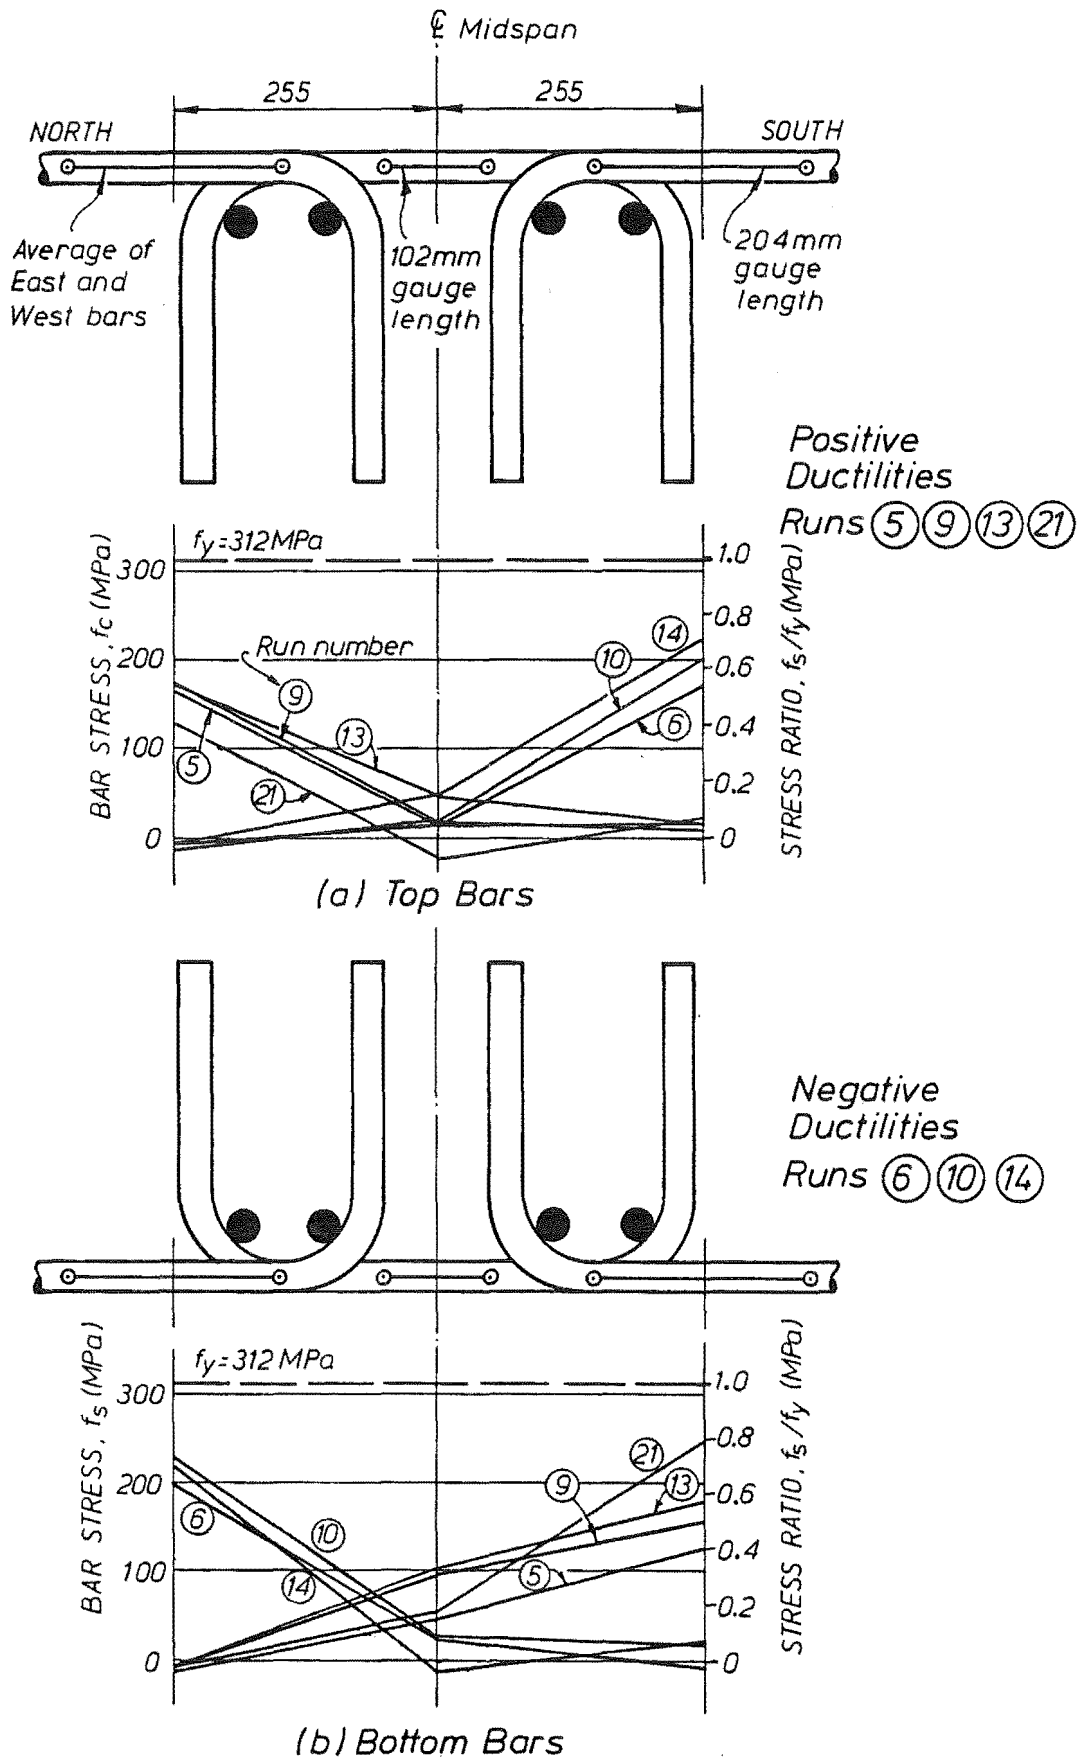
Stresses of the Beam Longitudinal Bars at the Connection at Midspan.
